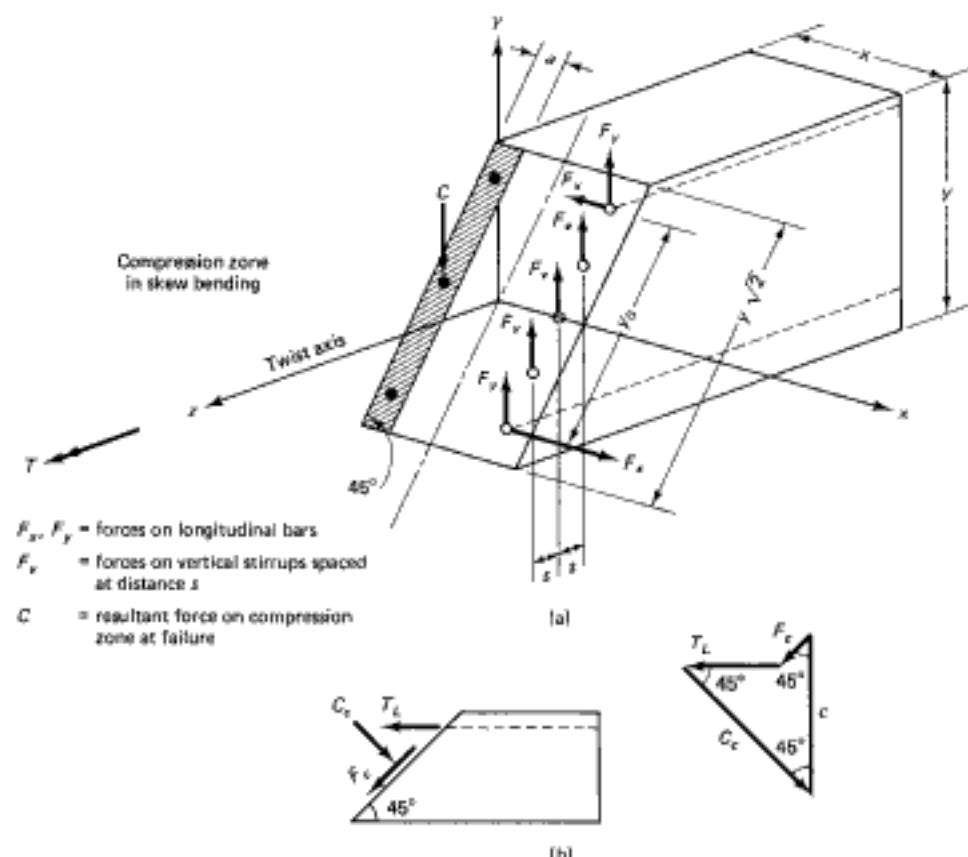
Forces on the skewly bent planes: (a) all forces acting on skew plane at failure; (b) vector forces on compression zone.
